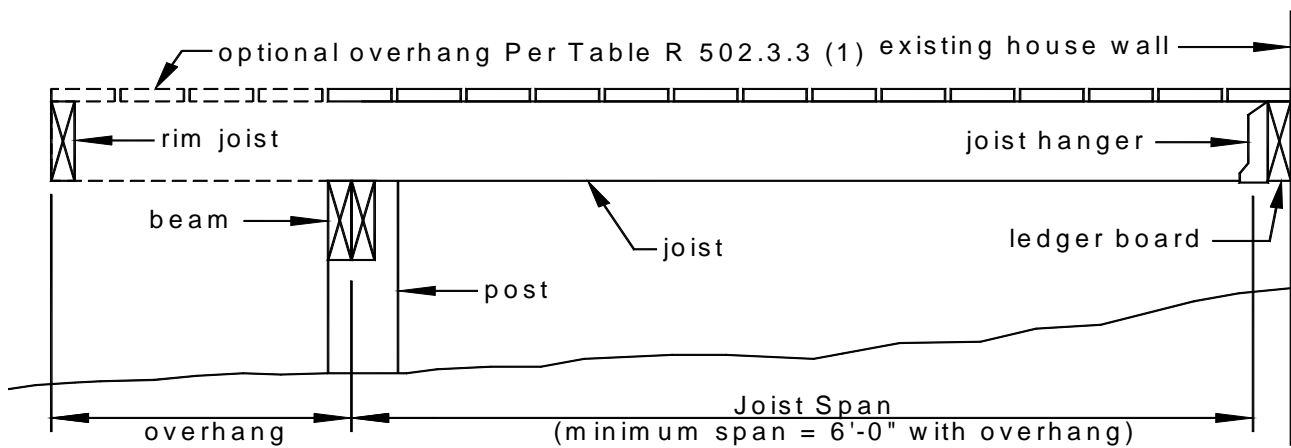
JOIST SPAN - DECK ATTACHED AT HOUSE
